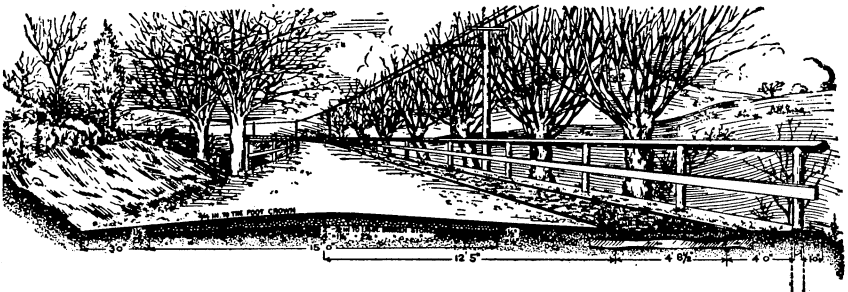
Standard road section (Massachusetts Highway Commission.)
